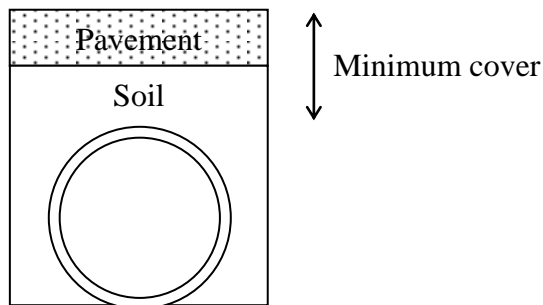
Geometry of Minimum Cover Including Rigid or Flexible Pavements
